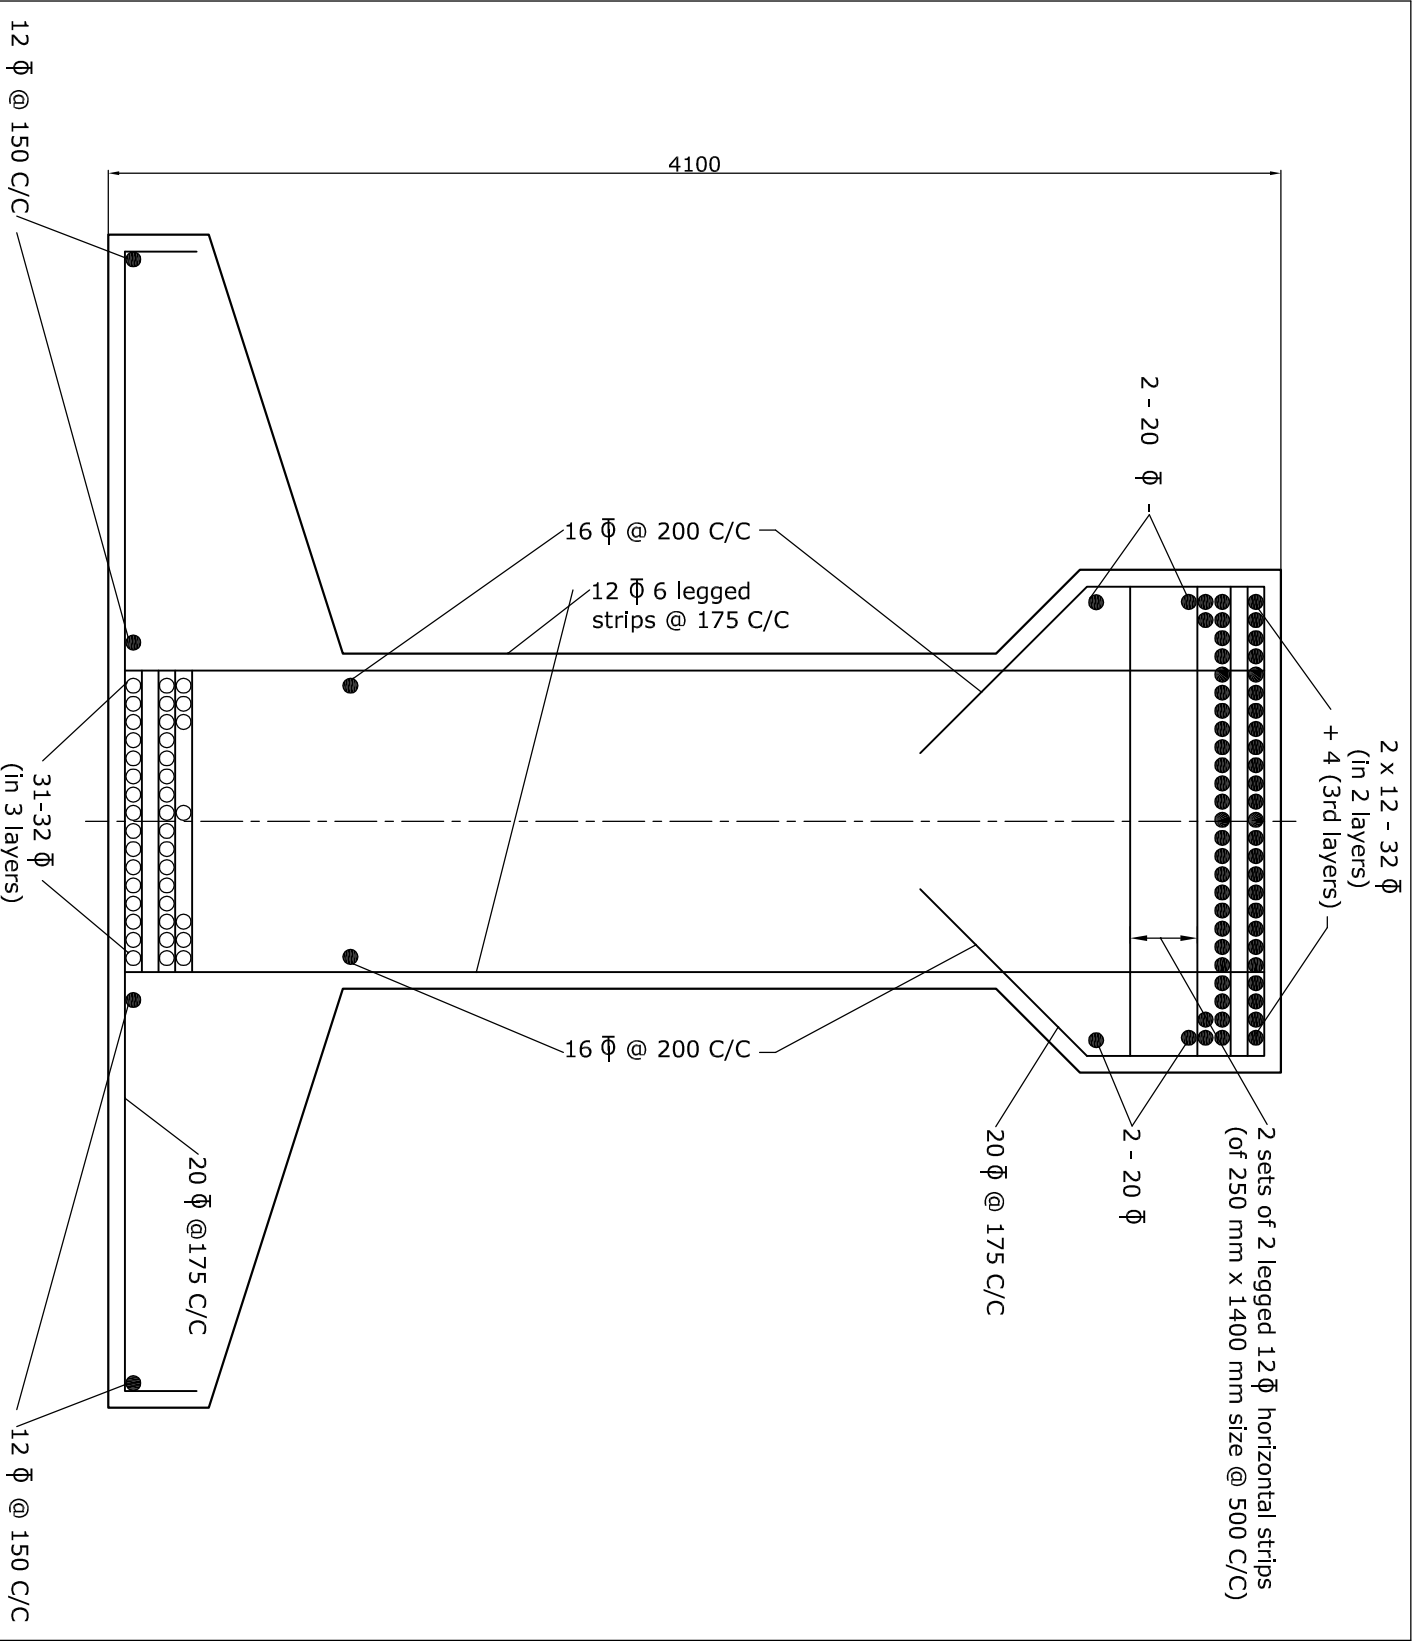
Rail Track Foundation (Typ. RCC Cross section)
